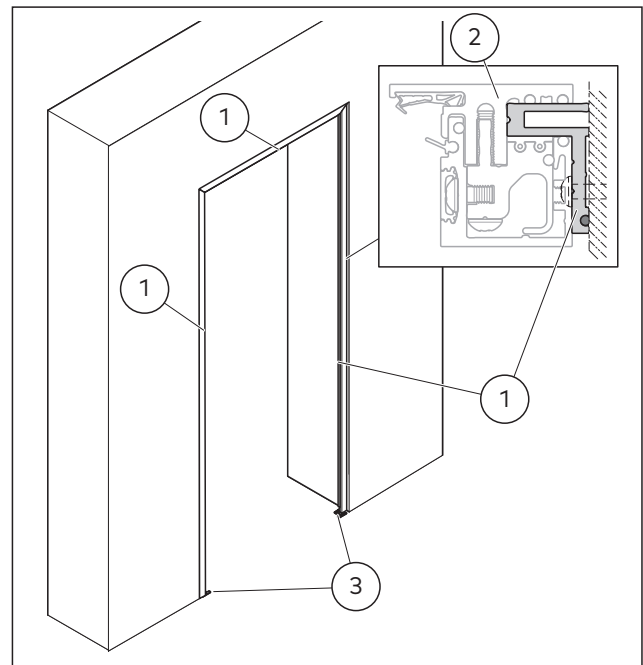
Example of an installation situation with direct wall connection without mounting profile
